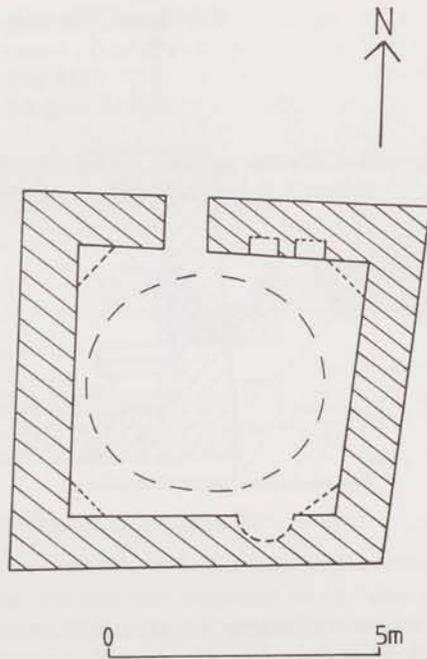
Shaykh Ghāzī (Kh.) (No. 132). Plan.
